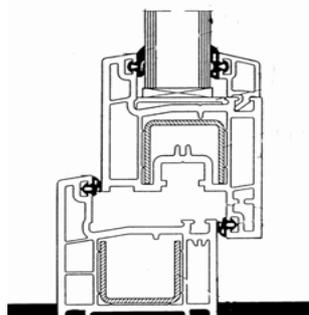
Cross section of PVC window frame, joint between fixed and operable members
